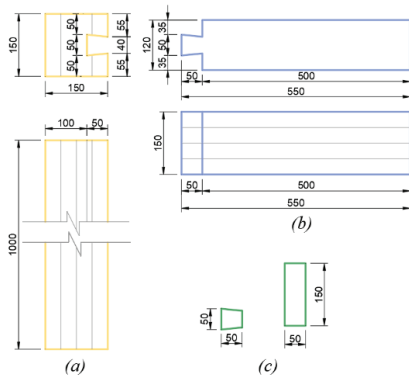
Dimension of components in joints: (a) Column; (b) Beam and (c) Crosser (Unit: mm).
